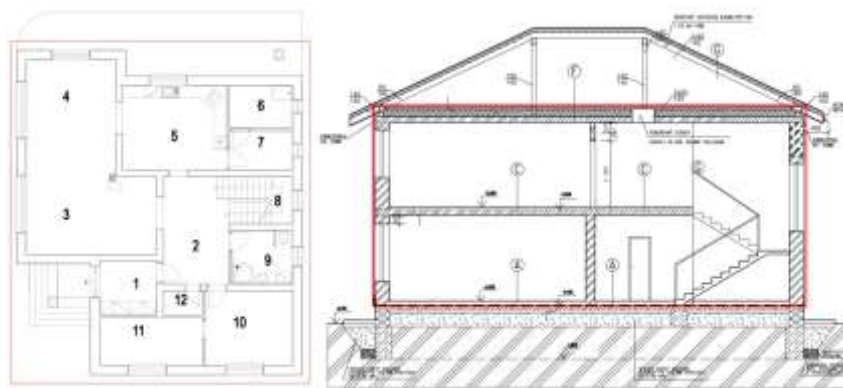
Schematic plan view of the ground floor and schematic sectional view of the object (the red lines presents zone under consideration).
